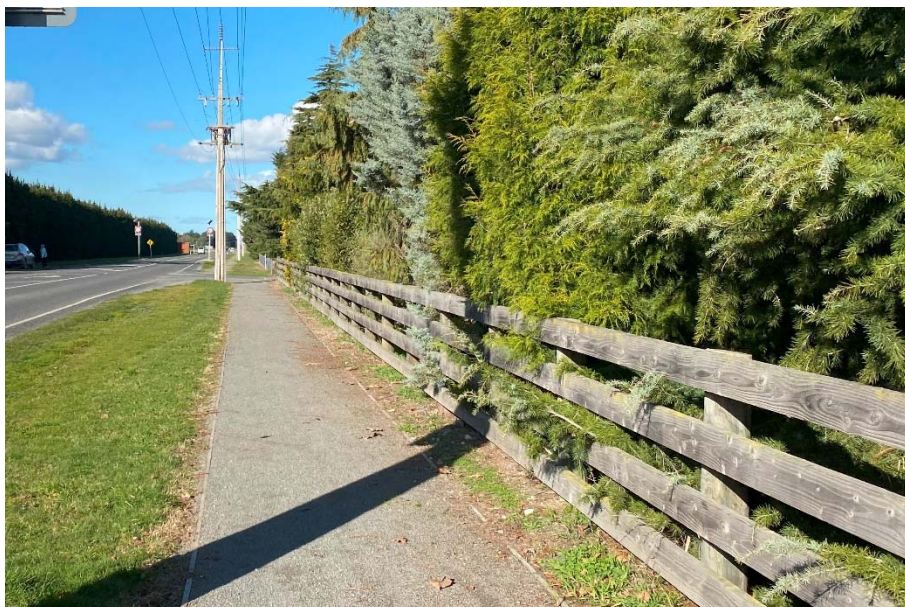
Tram Road / Tupelo Place Intersection Looking West (Eastern Site on Left)
